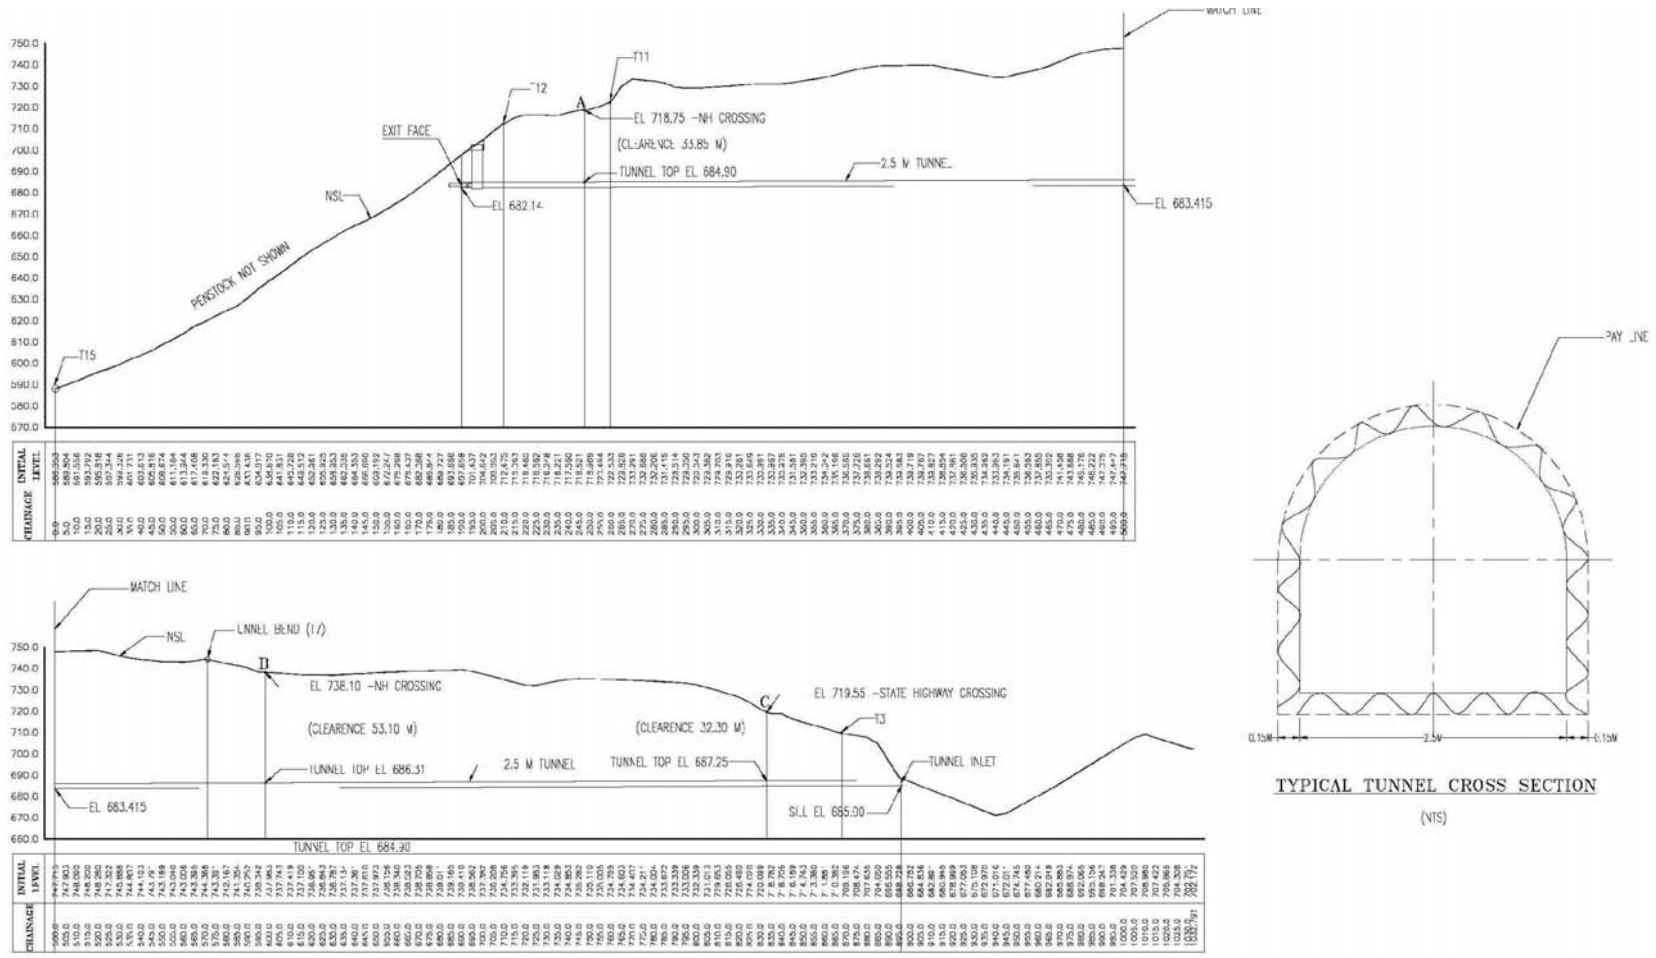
Typical run of river scheme layout having several bends in the tunnel alignment
